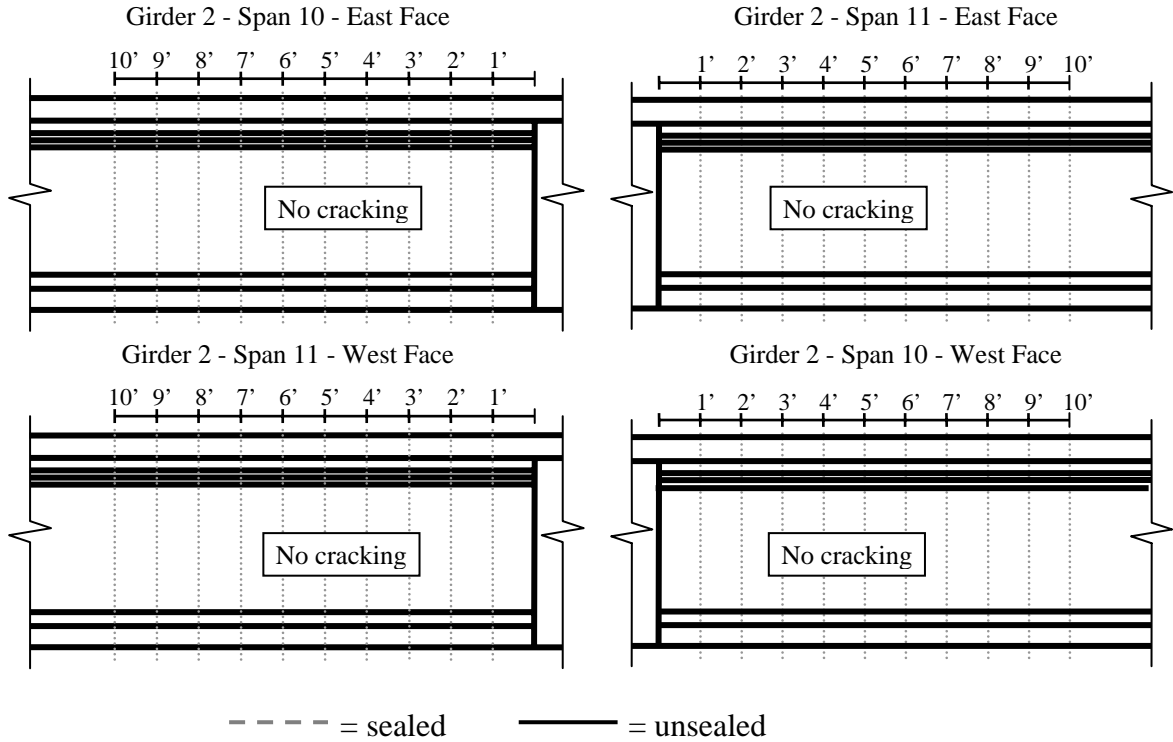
Girder Line 2 Cracking (Fason and Barnes 2004)
